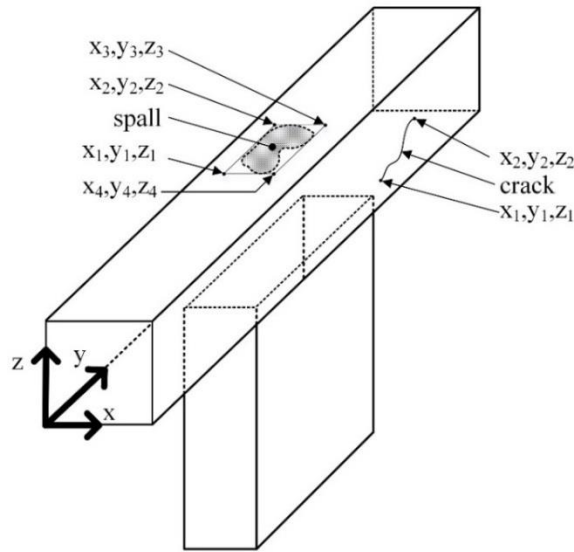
Illustration. Location of local element origin and defect coordinates on pier cap with square end— isometric view.
